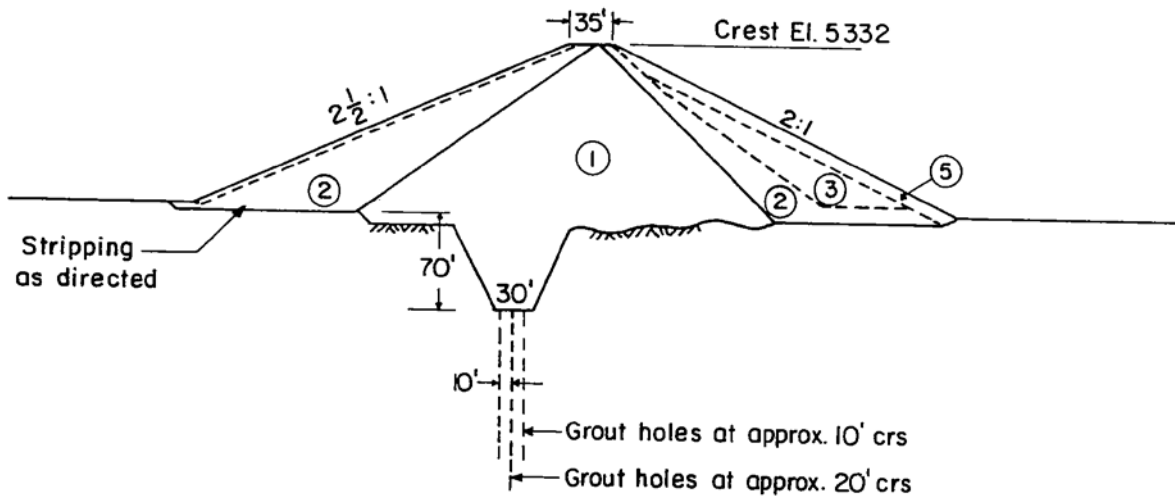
Typical cross section for abutments where embankment core (silt with some clay and gravel) is founded directly on jointed rhyolite.
